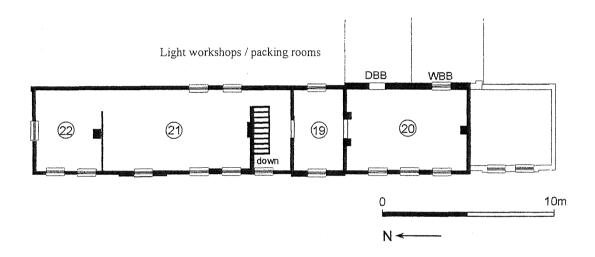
Second floor plan (Based on original drawings by BLB Architects of Redditch)
